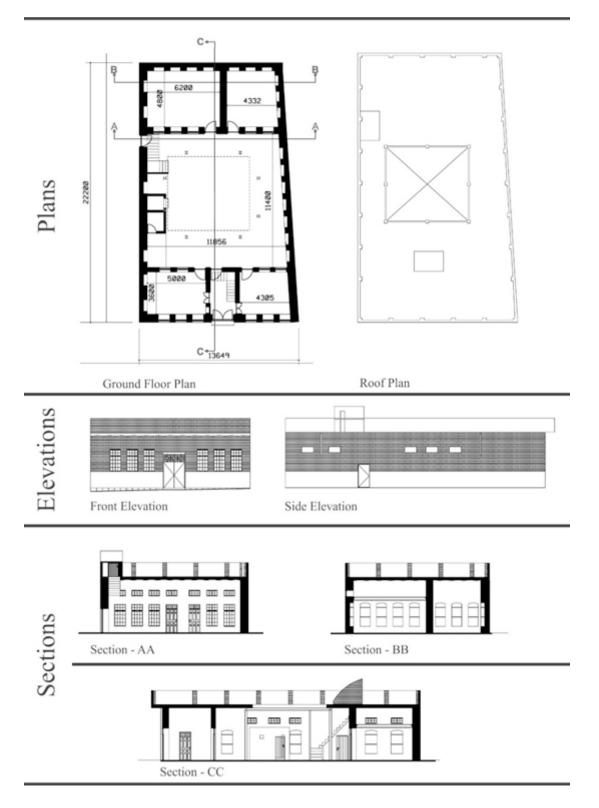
Plans, elevations and sections of house 03. (Abbas, 2015)
